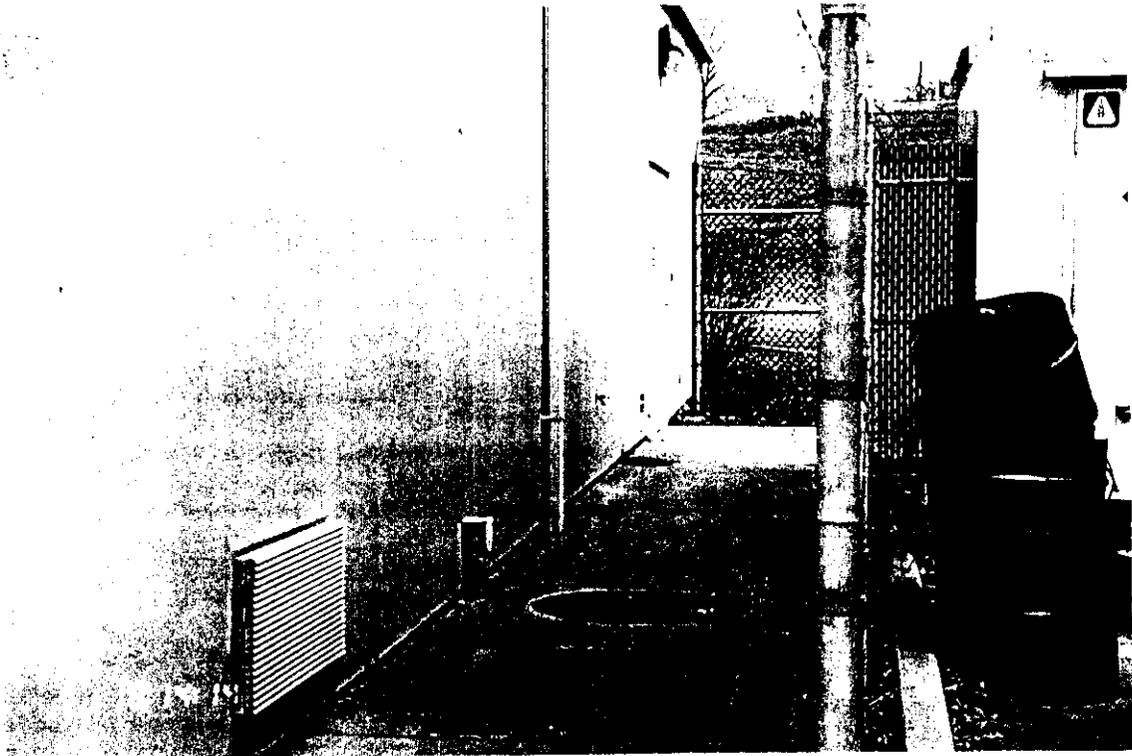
Photograph L: Existing Watts No. 909 (Type 2) BFP on 3/4" DCW make-up line to boiler/heating systems.
